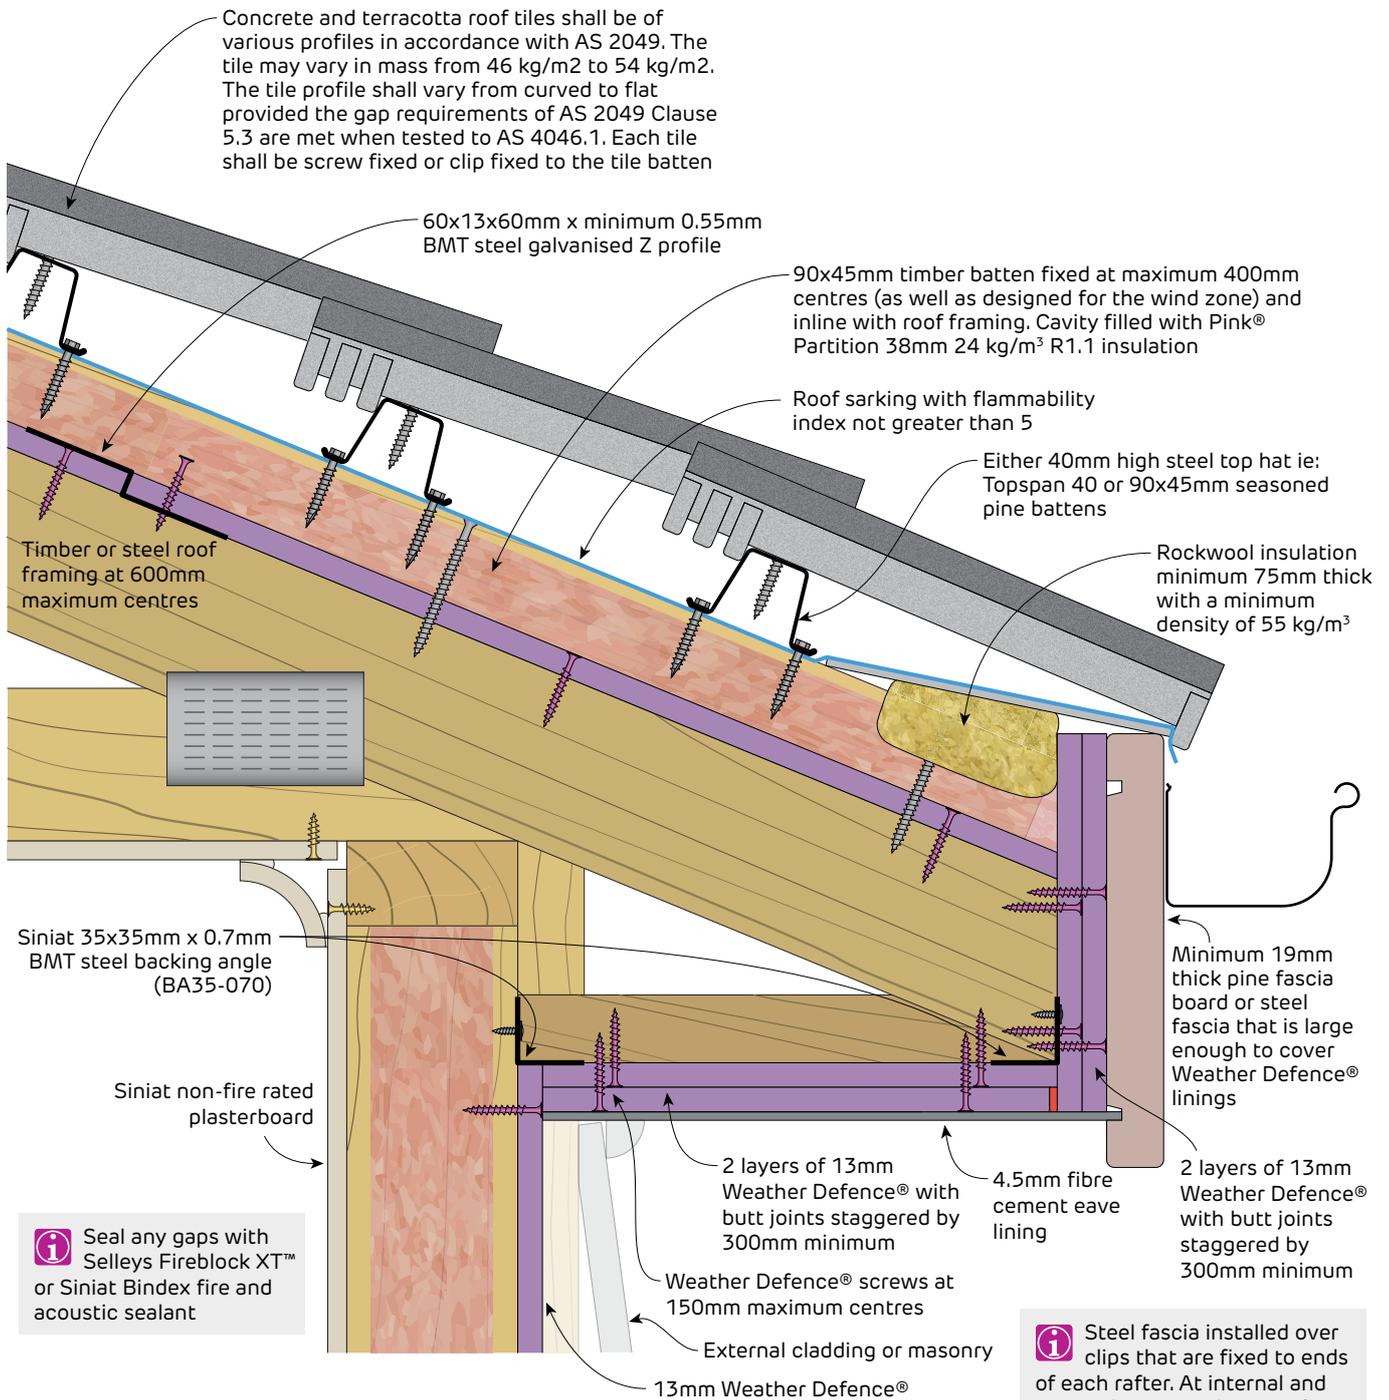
Eave and Fascia with Concrete or Terracotta Roof Tiles
